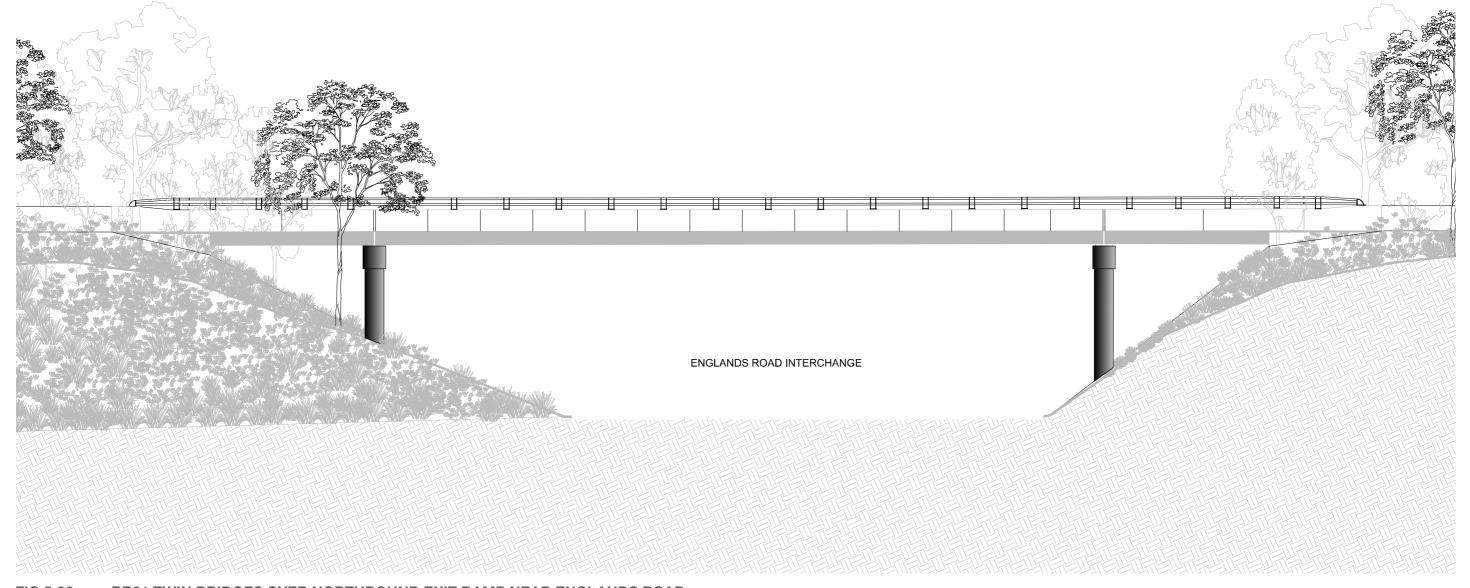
BR01 TWIN BRIDGES OVER NORTHBOUND EXIT RAMP NEAR ENGLANDS ROAD
